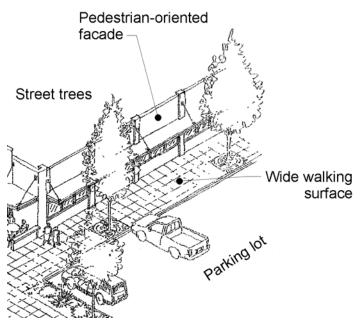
Example of an interior pathway that has been built to look more like a city sidewalk with street trees.
